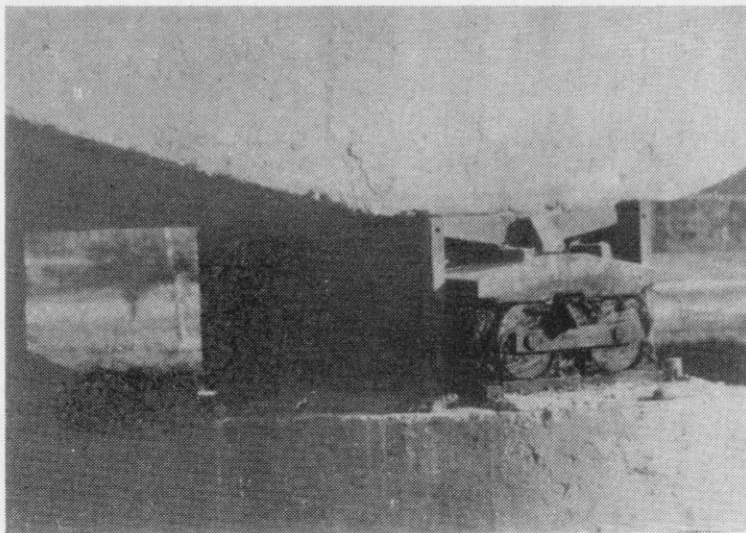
Hitting and closing of joint between deck and retaining wall at road level at the end close to Sonaimukh.
